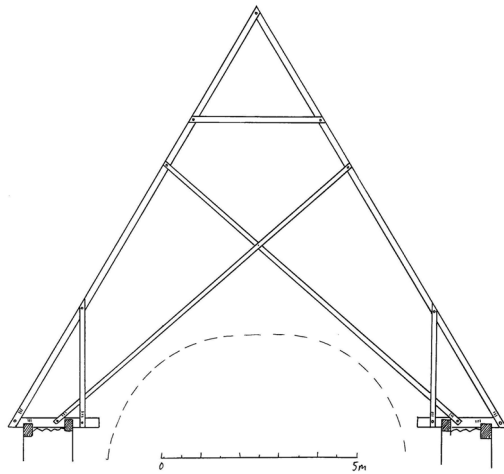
Section of the Gothic roofing in Säby with characteristic rafter feet and scissor beams. Each part in the rafter foot was numbered before assembly. Drawing by R. Gullbrandsson.
